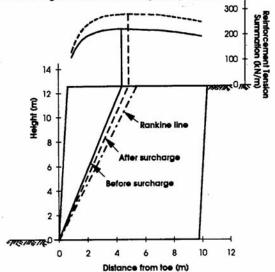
Location of the planar surfaces with maximum RTS at the Rainier Ave. wall.
